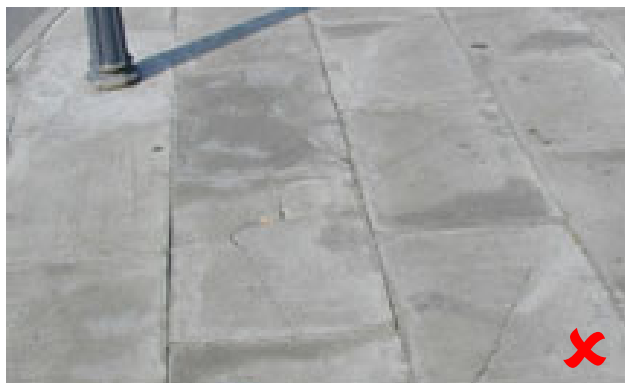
Saltburn: Cracked paving caused by unsuitable original specification and vehicle overrun. Concrete splattered bollard installation.
